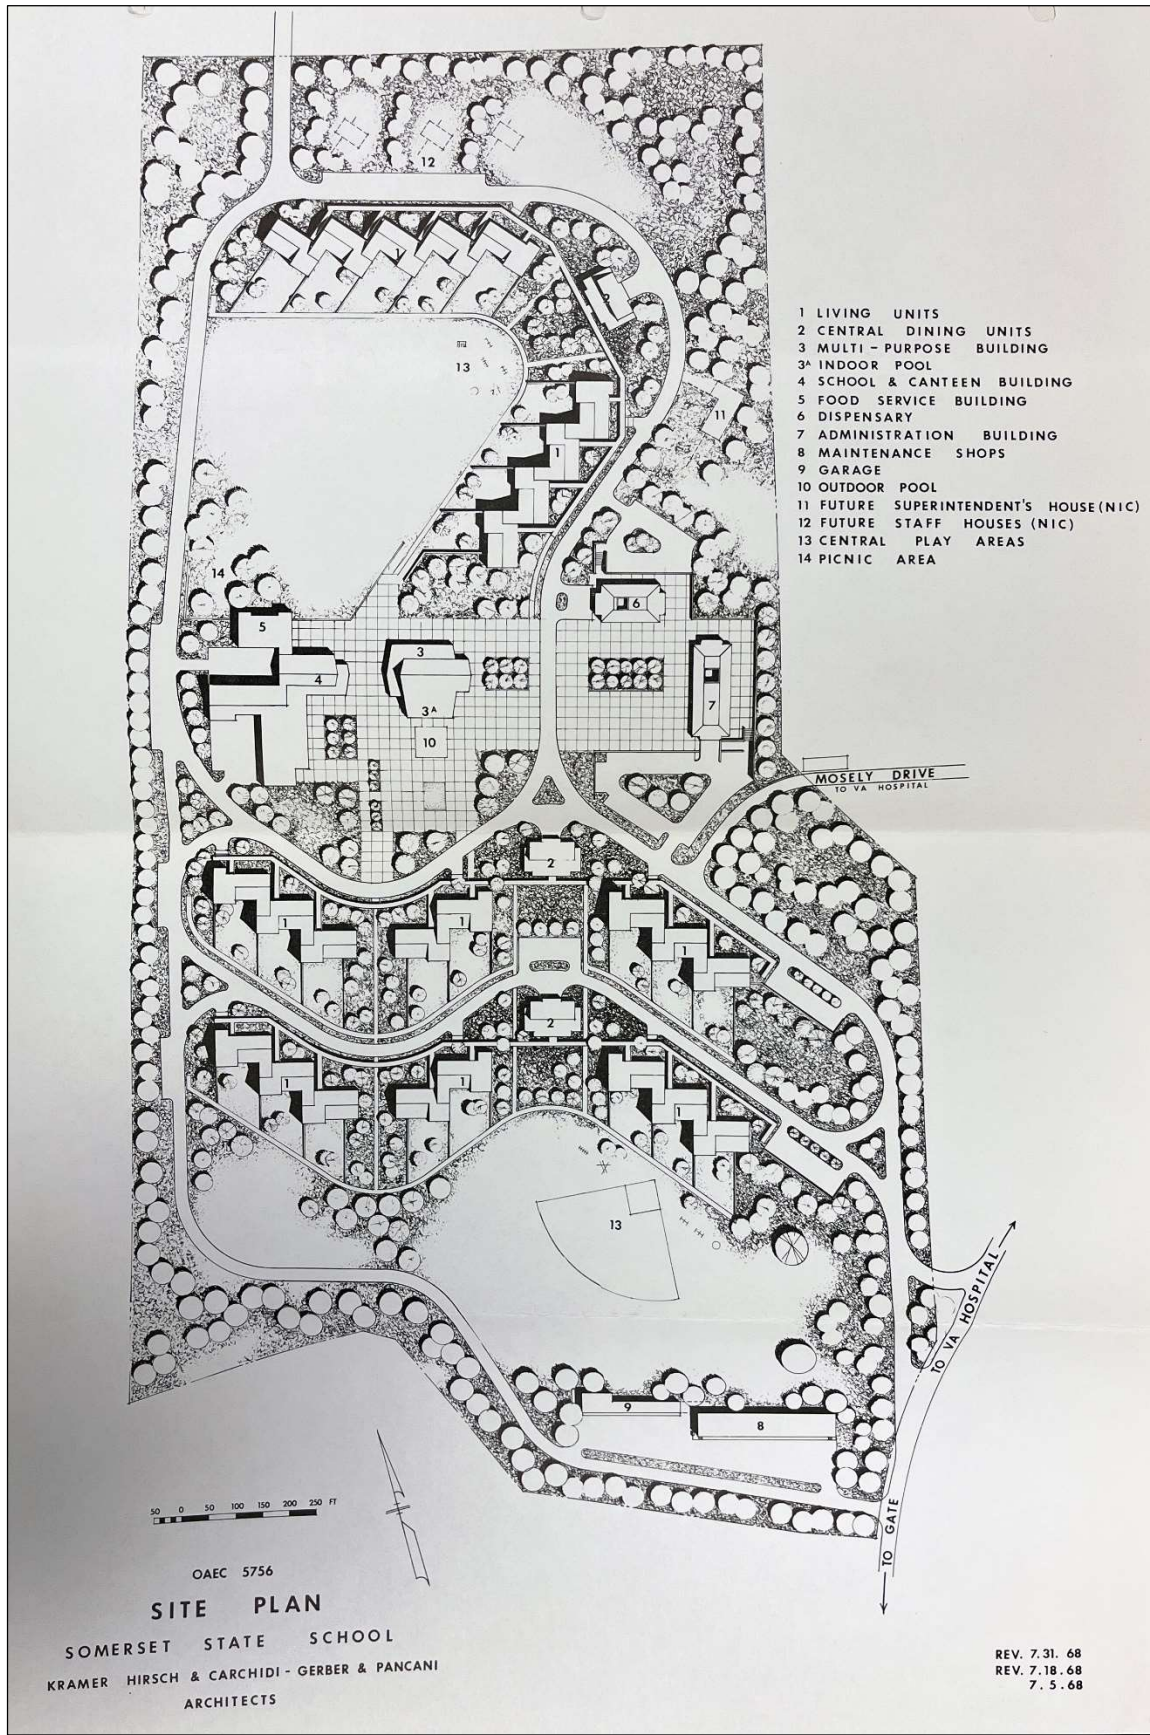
1968 Site Plan for Somerset State School (Source: Box 1, Department of Institutions and Agencies Collection, New Jersey State Archives, Trenton, NJ).
